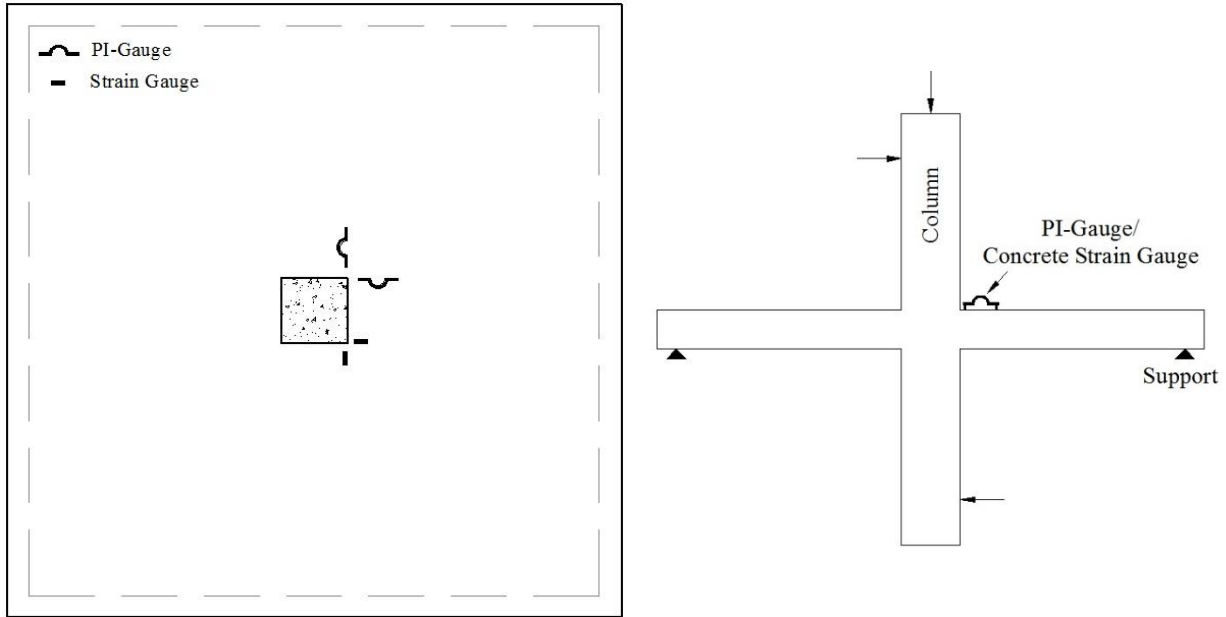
Typical PI-gauges/ concrete strain gauges arrangement
